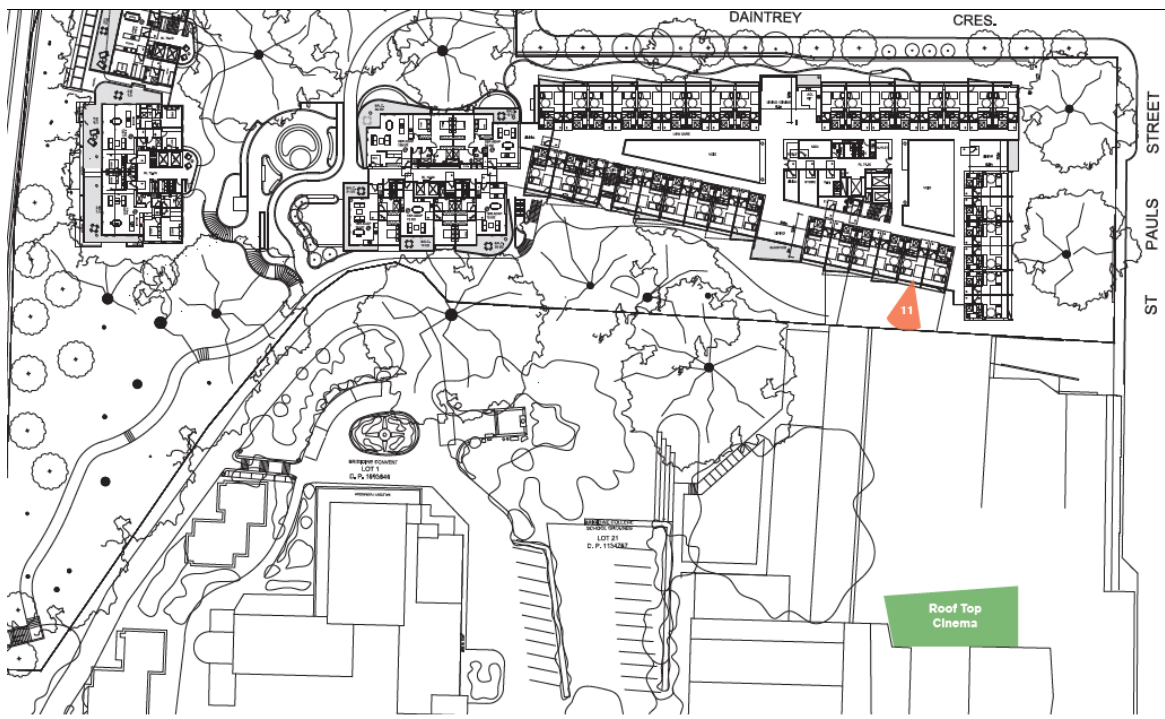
Level 3 – Window location at St Basils Aged Care Facility
